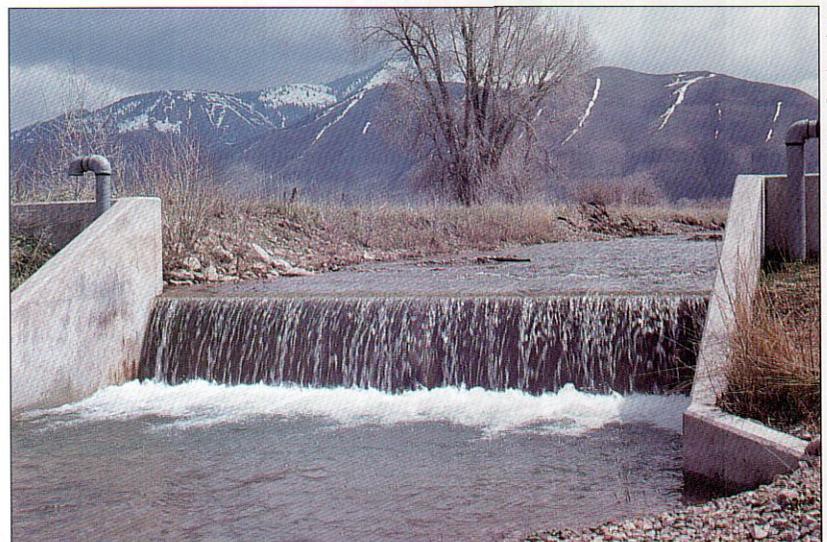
A drop structure slows water upstream, allowing sediment to drop to the bottom. The fall over the structure helps aerate water downstream, improving conditions for trout and other fish.
